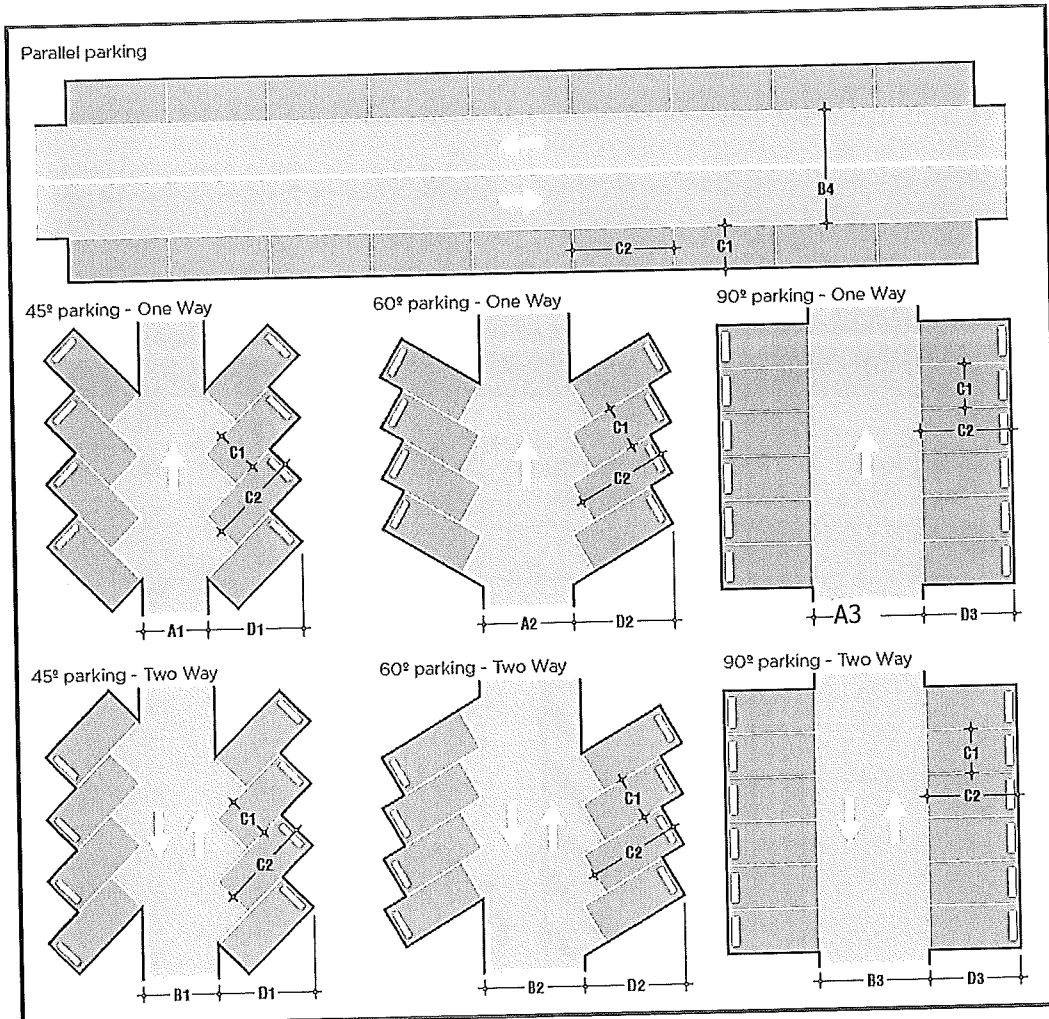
Parking Lot Stall, Aisle and Parking Bay Dimensions
